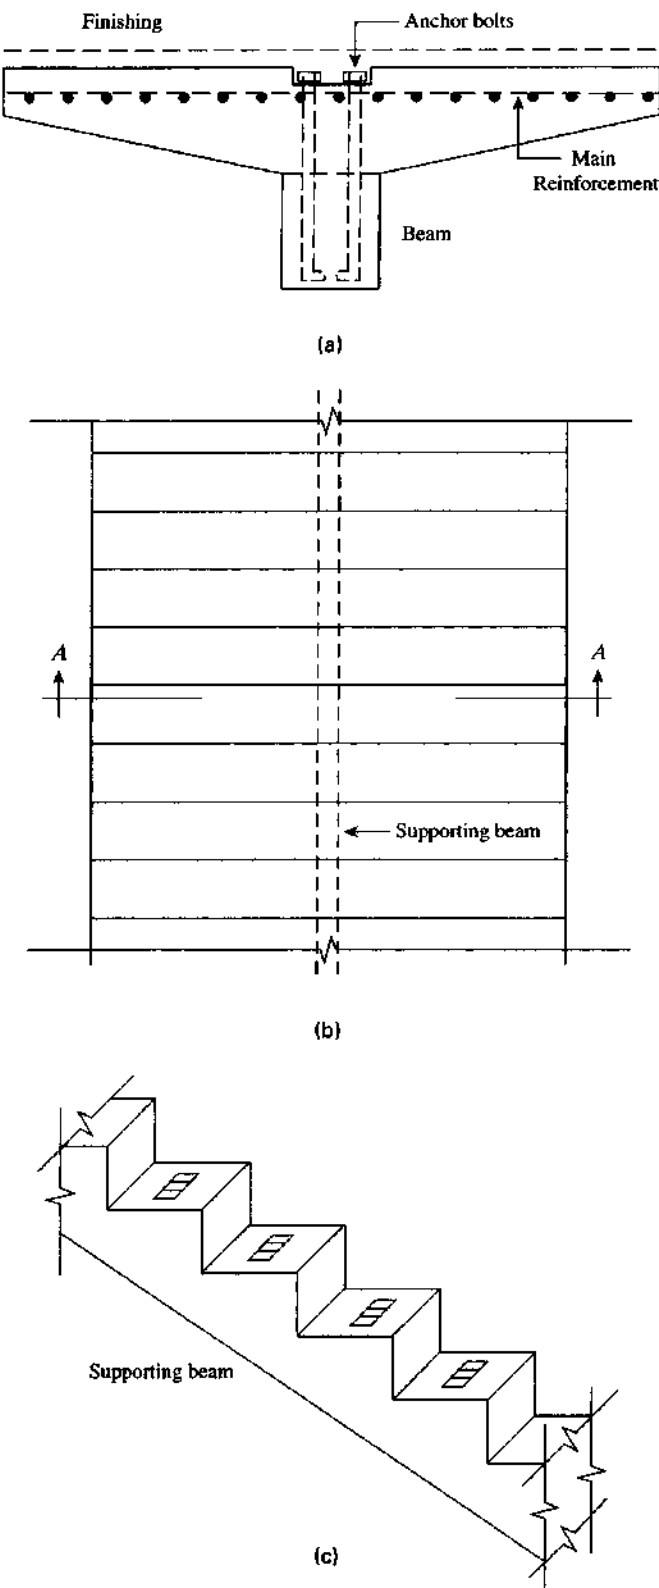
Precast cantilever stair supported by central beam: (a) section A-A, (b) part plan, and (c) supporting beam.
